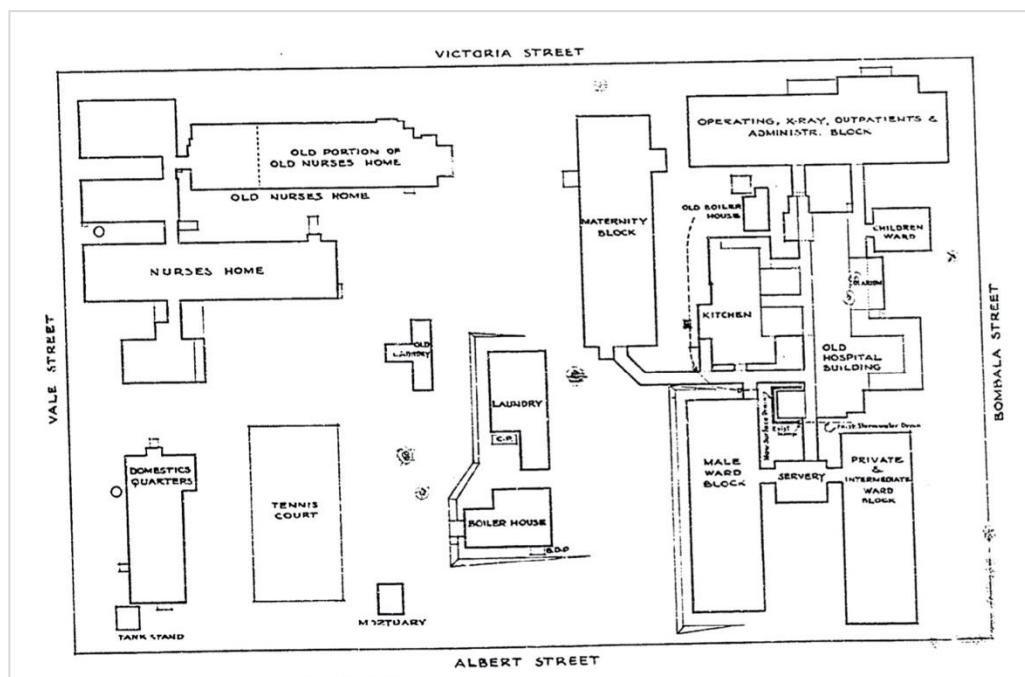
c1950s block plan for the Cooma Hospital, included in undated and unsigned drawing for "remodelling of existing hospital building", showing the location of existing and proposed new buildings at the hospital site. (Source: NSW Plan Services (PWA), PH52-32 – Cooma Hospital – Existing Building Remodelling – Site & Floor Plan – Elevations & Sections)
